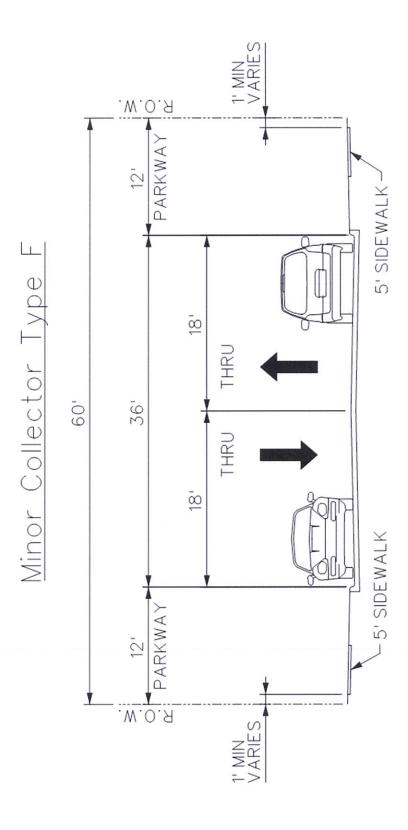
Collector Type- F Standard Construction Details Paving
